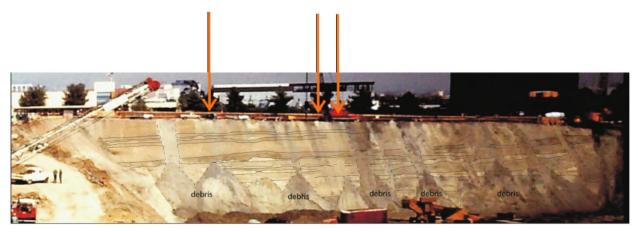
Century City Theme Towers during Construction circa 1972 – North Side of Excavation Illustrating Lack of Faulting in Soil Layers
